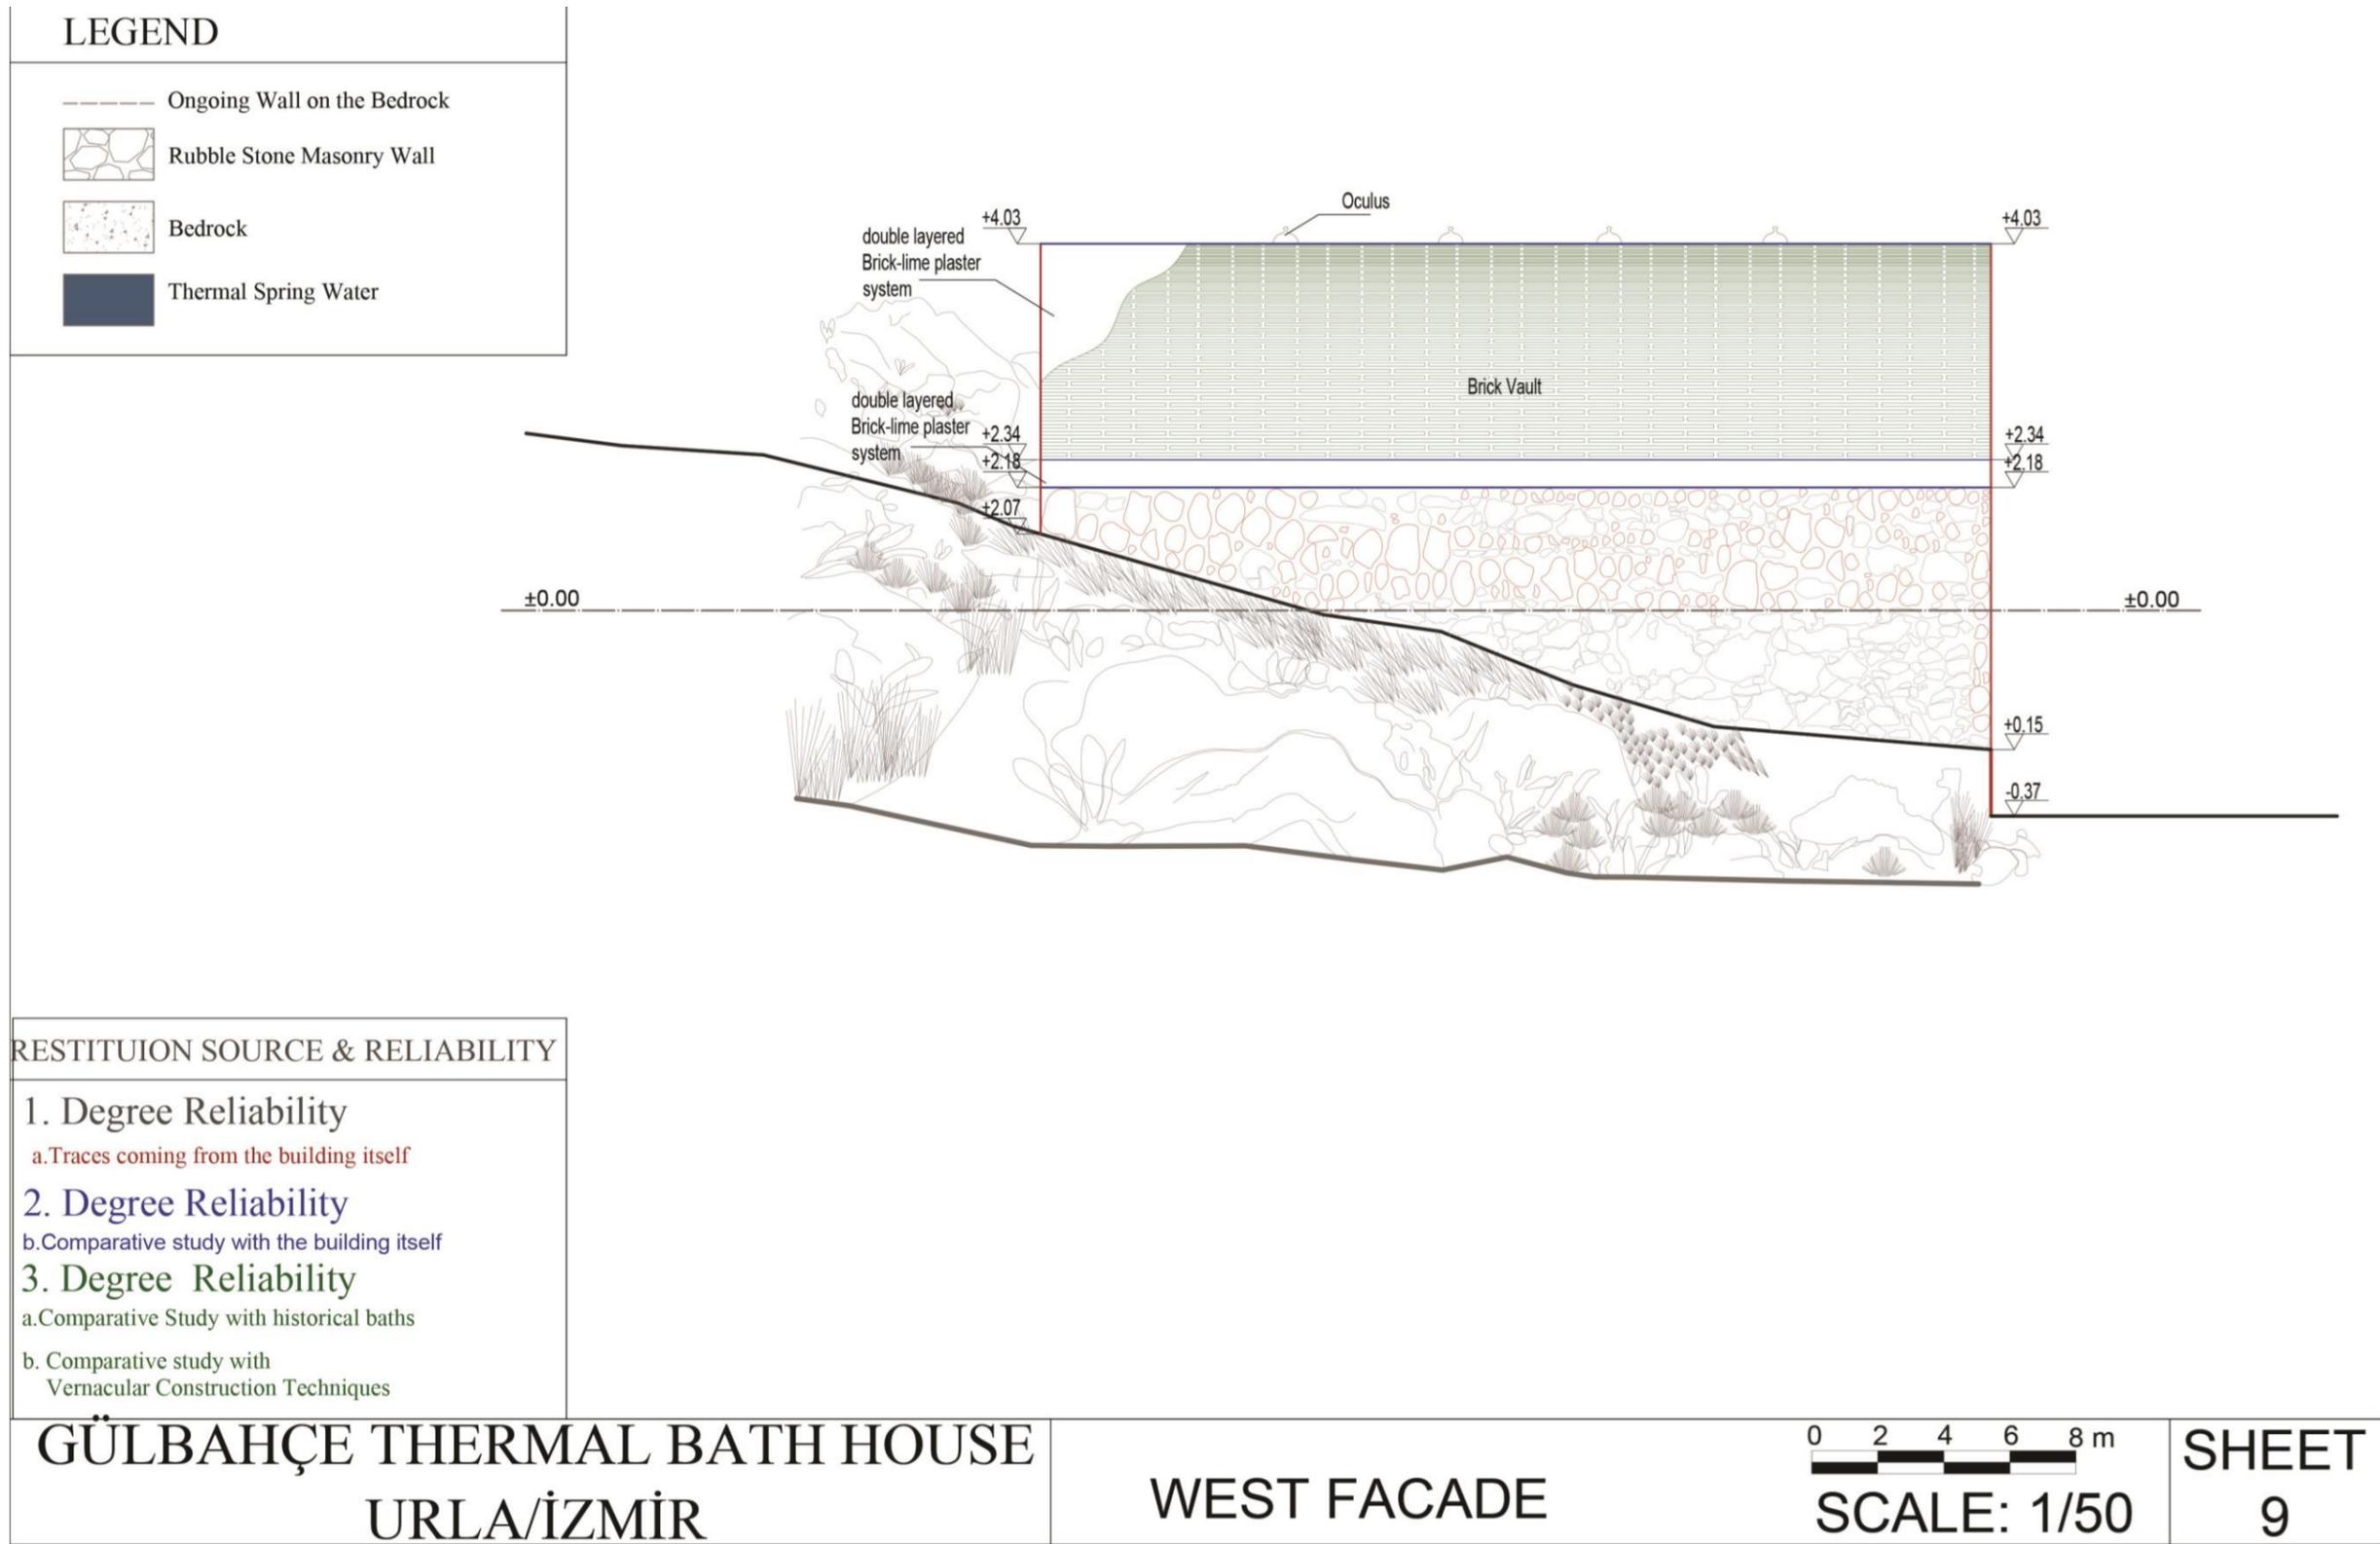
West Elevation -Restitution (Source: İYTE,2019)
